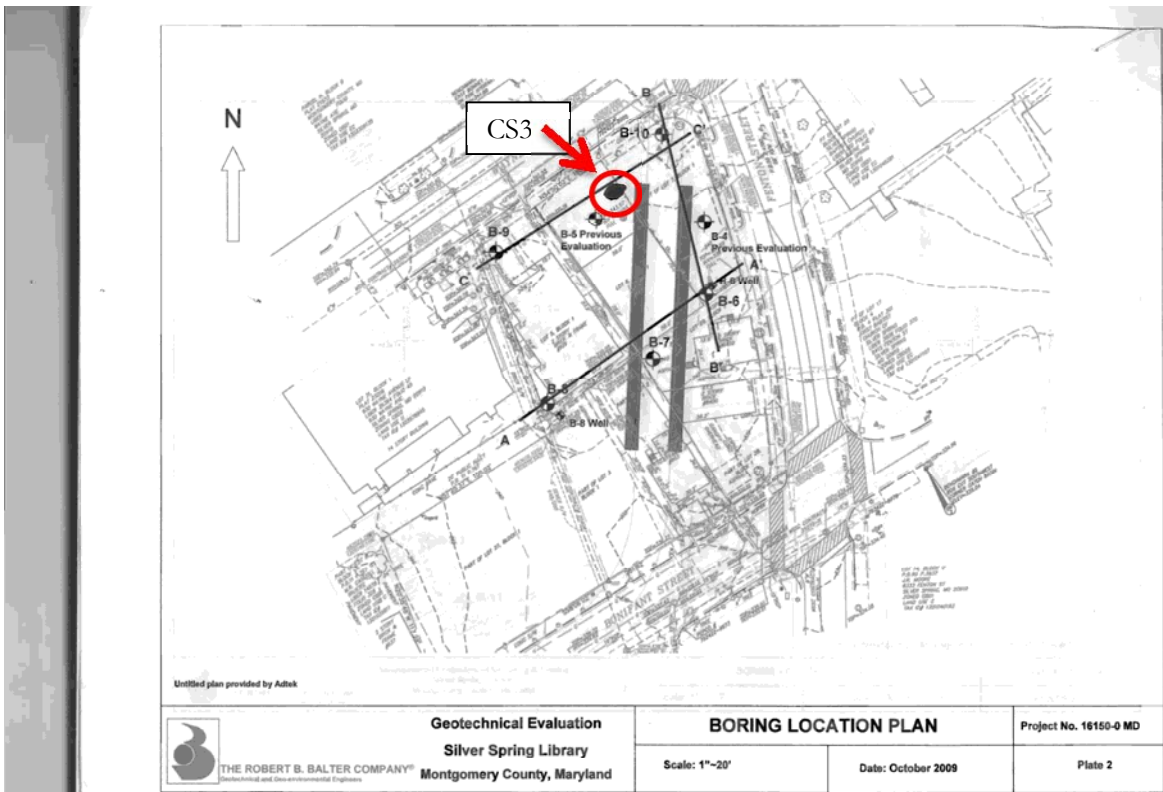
Test Plan Showing B-9, B-5, B10, and CS3 (From Geotechnical Report Provided by MBP)
